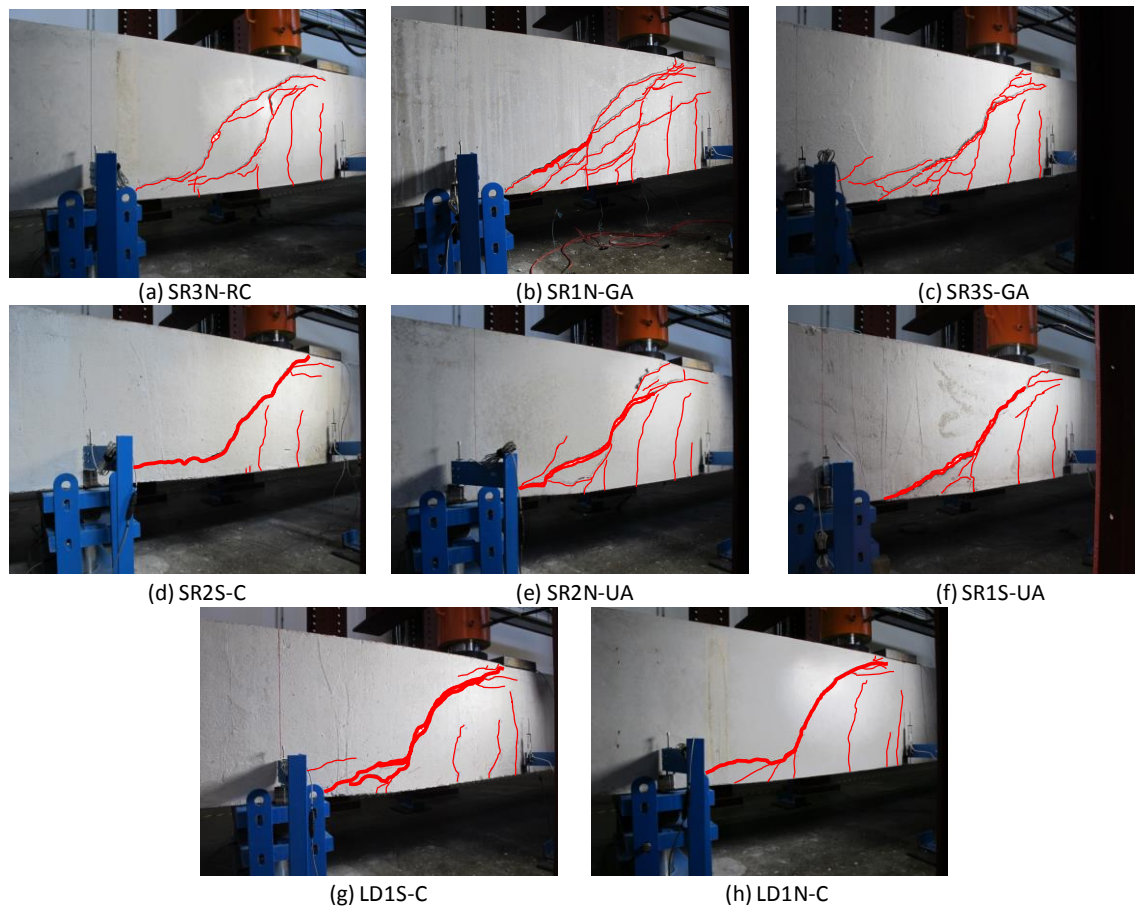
Diagonal cracking pattern at failure for all test spans.
